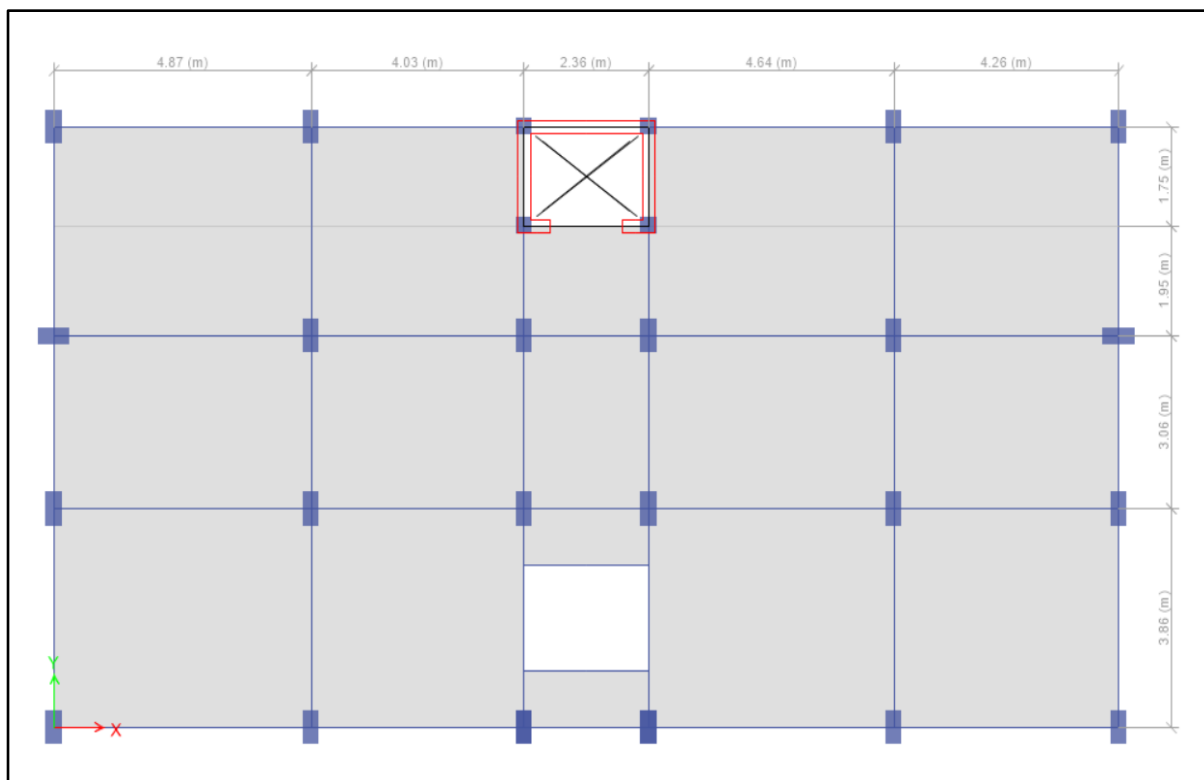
Shear Wall at Three periphery sides of lift plan in ETABS
